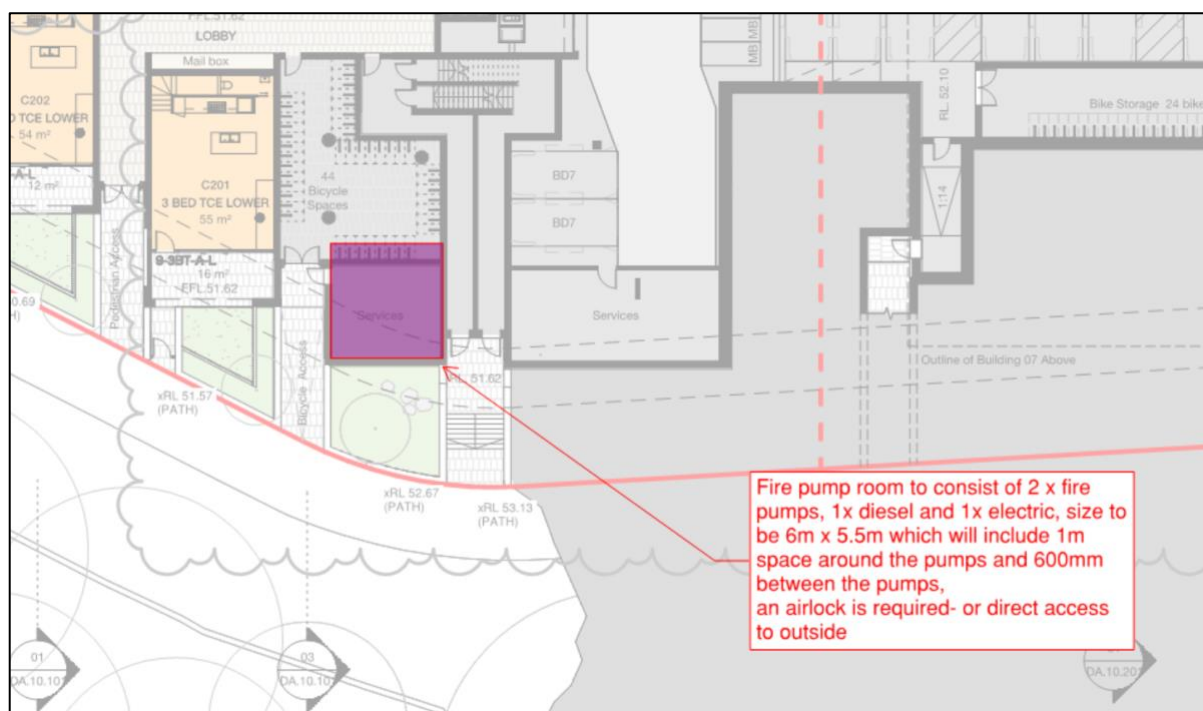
Proposed Location of Fire Services fronting Canberra Avenue (Level 2 Floor Plan)
